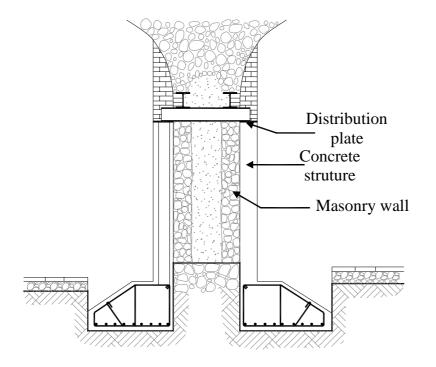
Example of concrete reinforcement of an existing foundation ([1] fig. 74)
